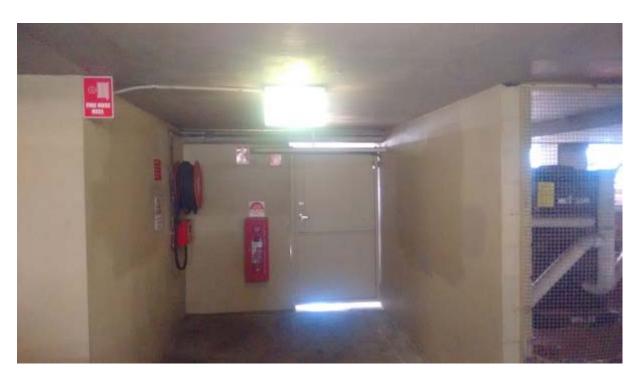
Close-up photo of the fire escape. The bright light on the ceiling is an illuminated exit sign.
